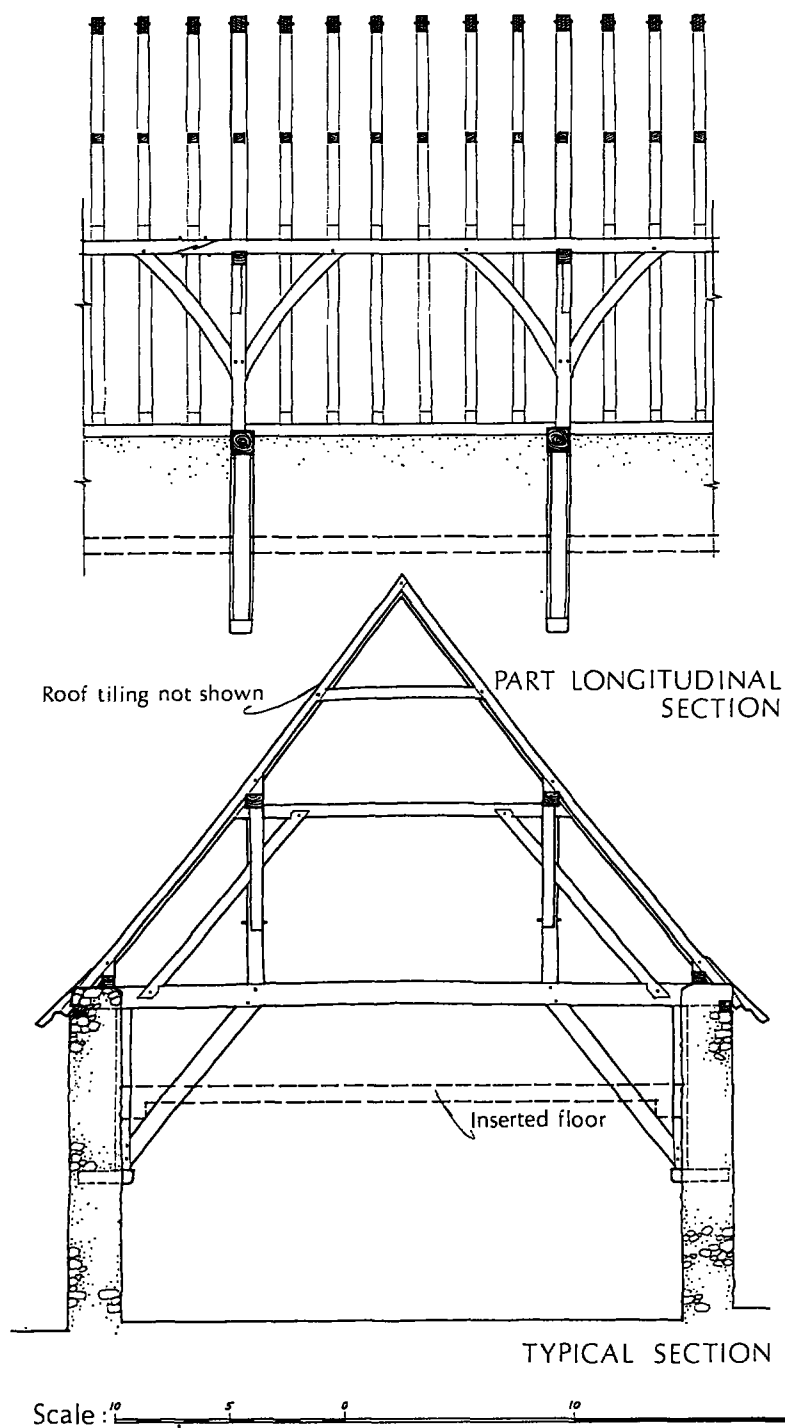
'The Stables', Wherwell Abbey: part of the phase one roof of 1250, with longitudinal section (above) and cross section (below) showing the short, vertical ashlar pieces from inner wall plates and arcade plates to rafters (Drawing by John Reynolds)
